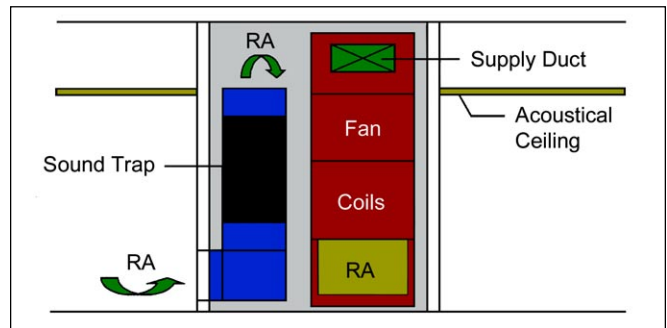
C: Front elevation view of classroom HVAC unit in closet.
